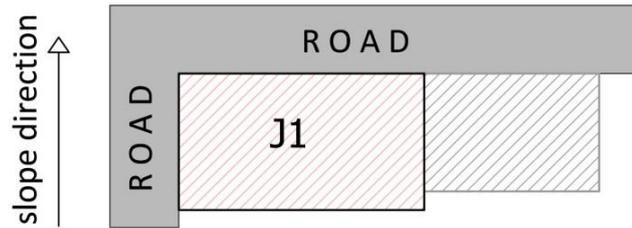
Schematic drawing of the building juxtposed by building on its one side
